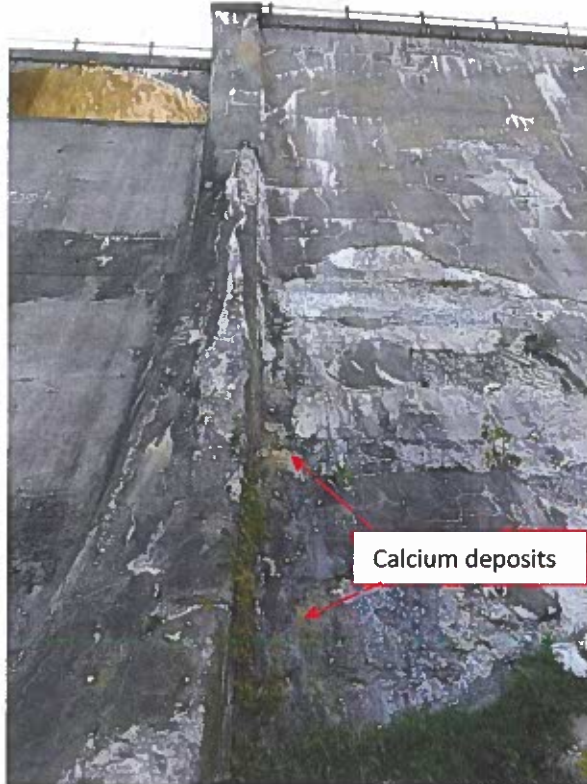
Efflorescence and spalling of concrete at toe of left training wall. Note calcium deposits on left downstream face.
